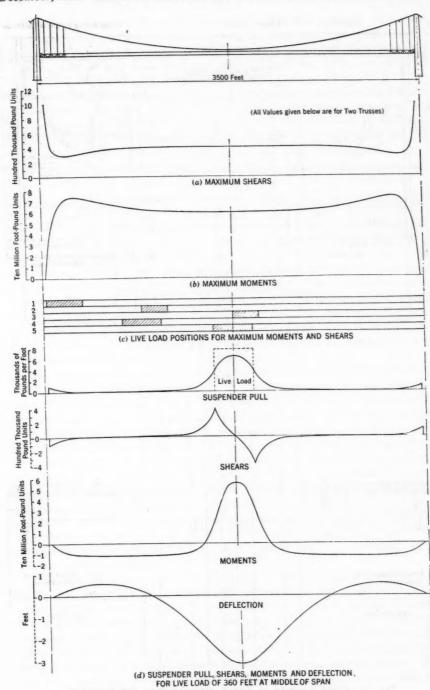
STIFFENING TRUSSES, CENTER SPAN.
